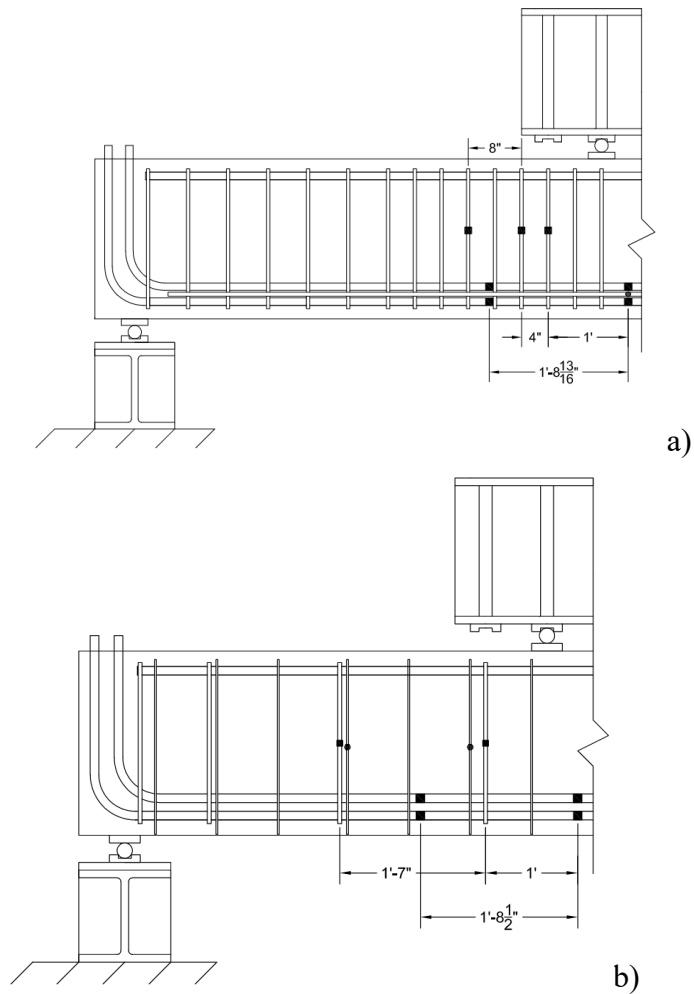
Locations of strain gages on (a) flexural beam specimen and (b) shear beam specimen.
